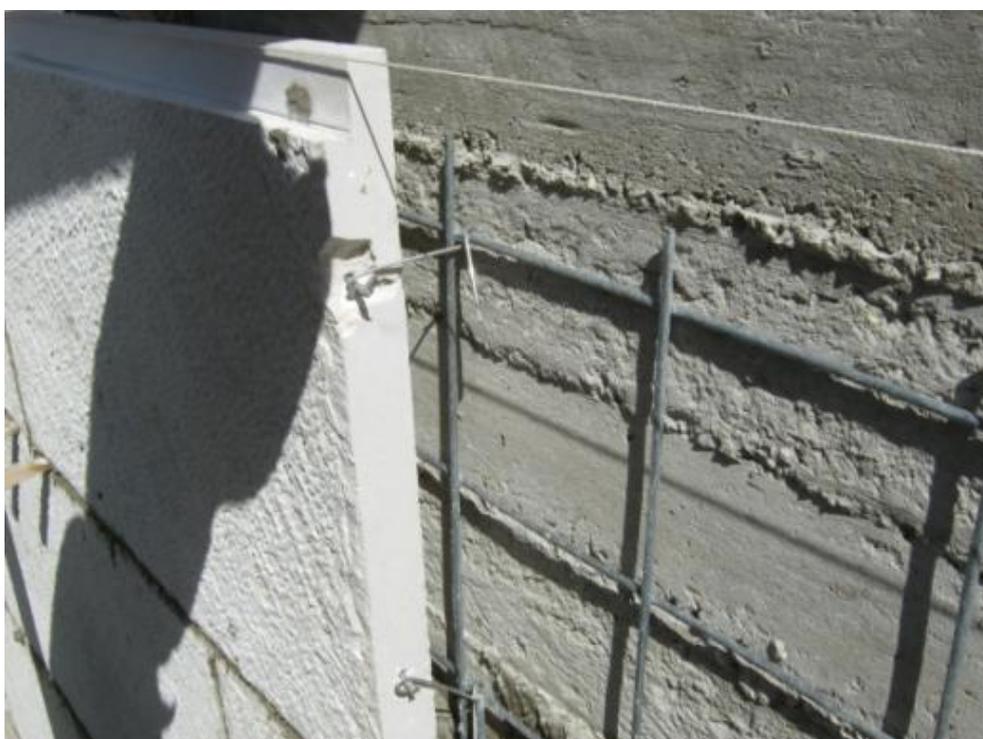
Side Ties for Fastening Stone Cladding to a Shear Wall Building
